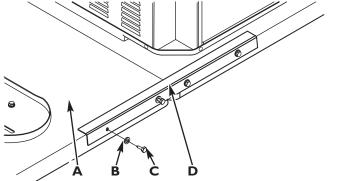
Start Lag Bolts into Mounting Pad Holes
